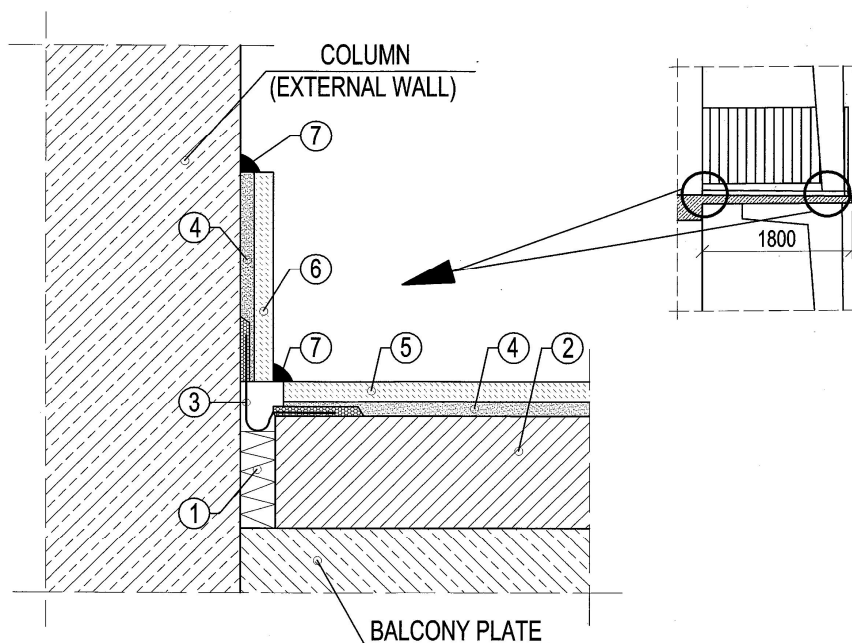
Sealing spots crucial for building's lifetime (balcony plate-column and balcony plate-wall connections)
